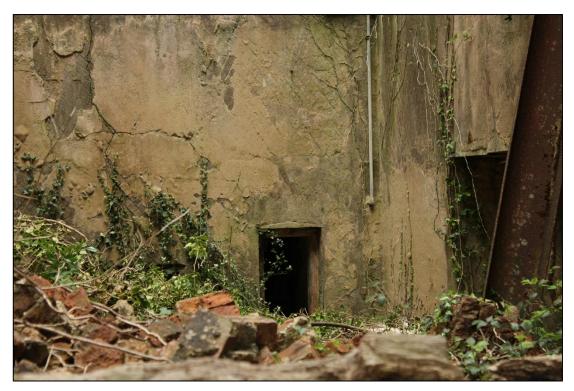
View of east wall of Servants Hall, ground floor of Cell G
